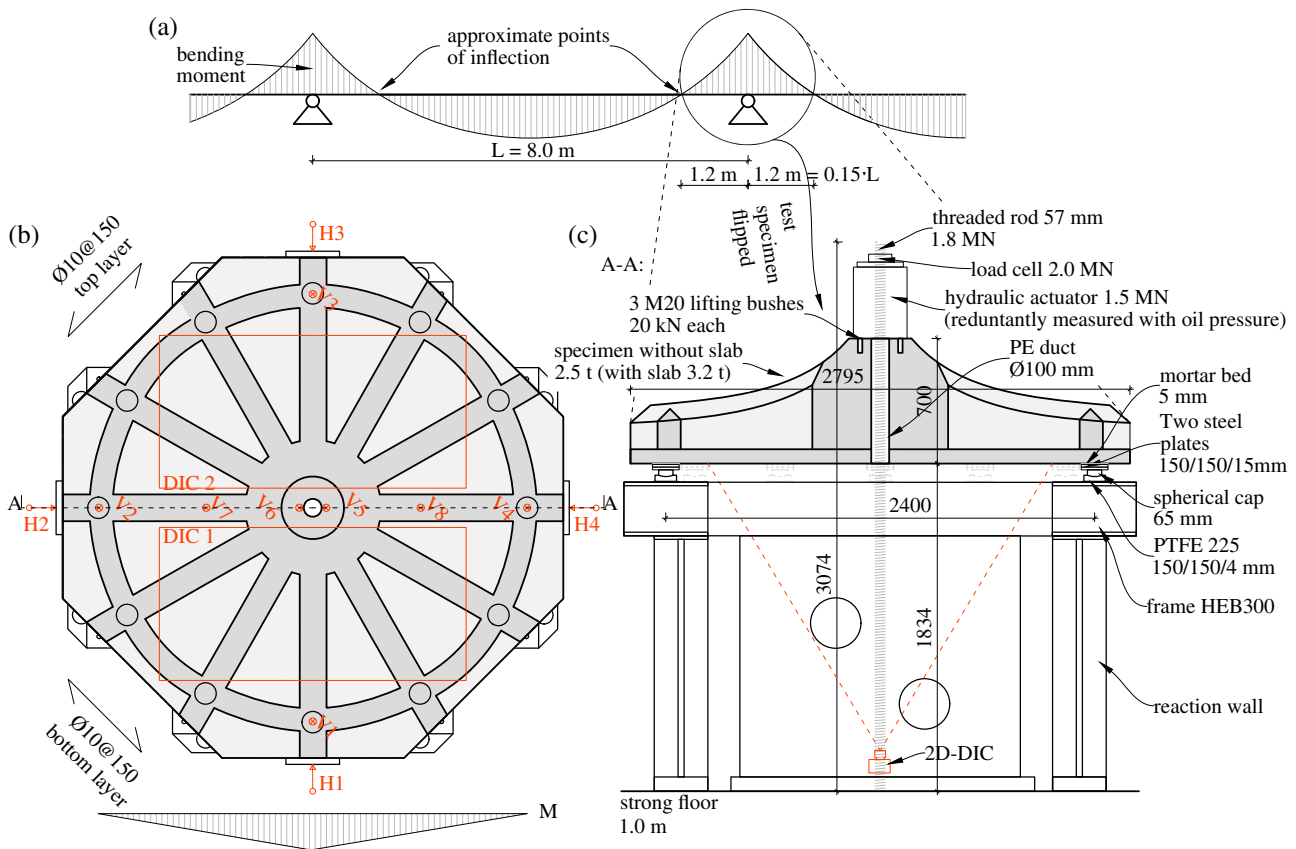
Test setup and instrumentation for the slab tests: (a) moment diagram with points of inflection; (b) plan and (c) section A-A.
